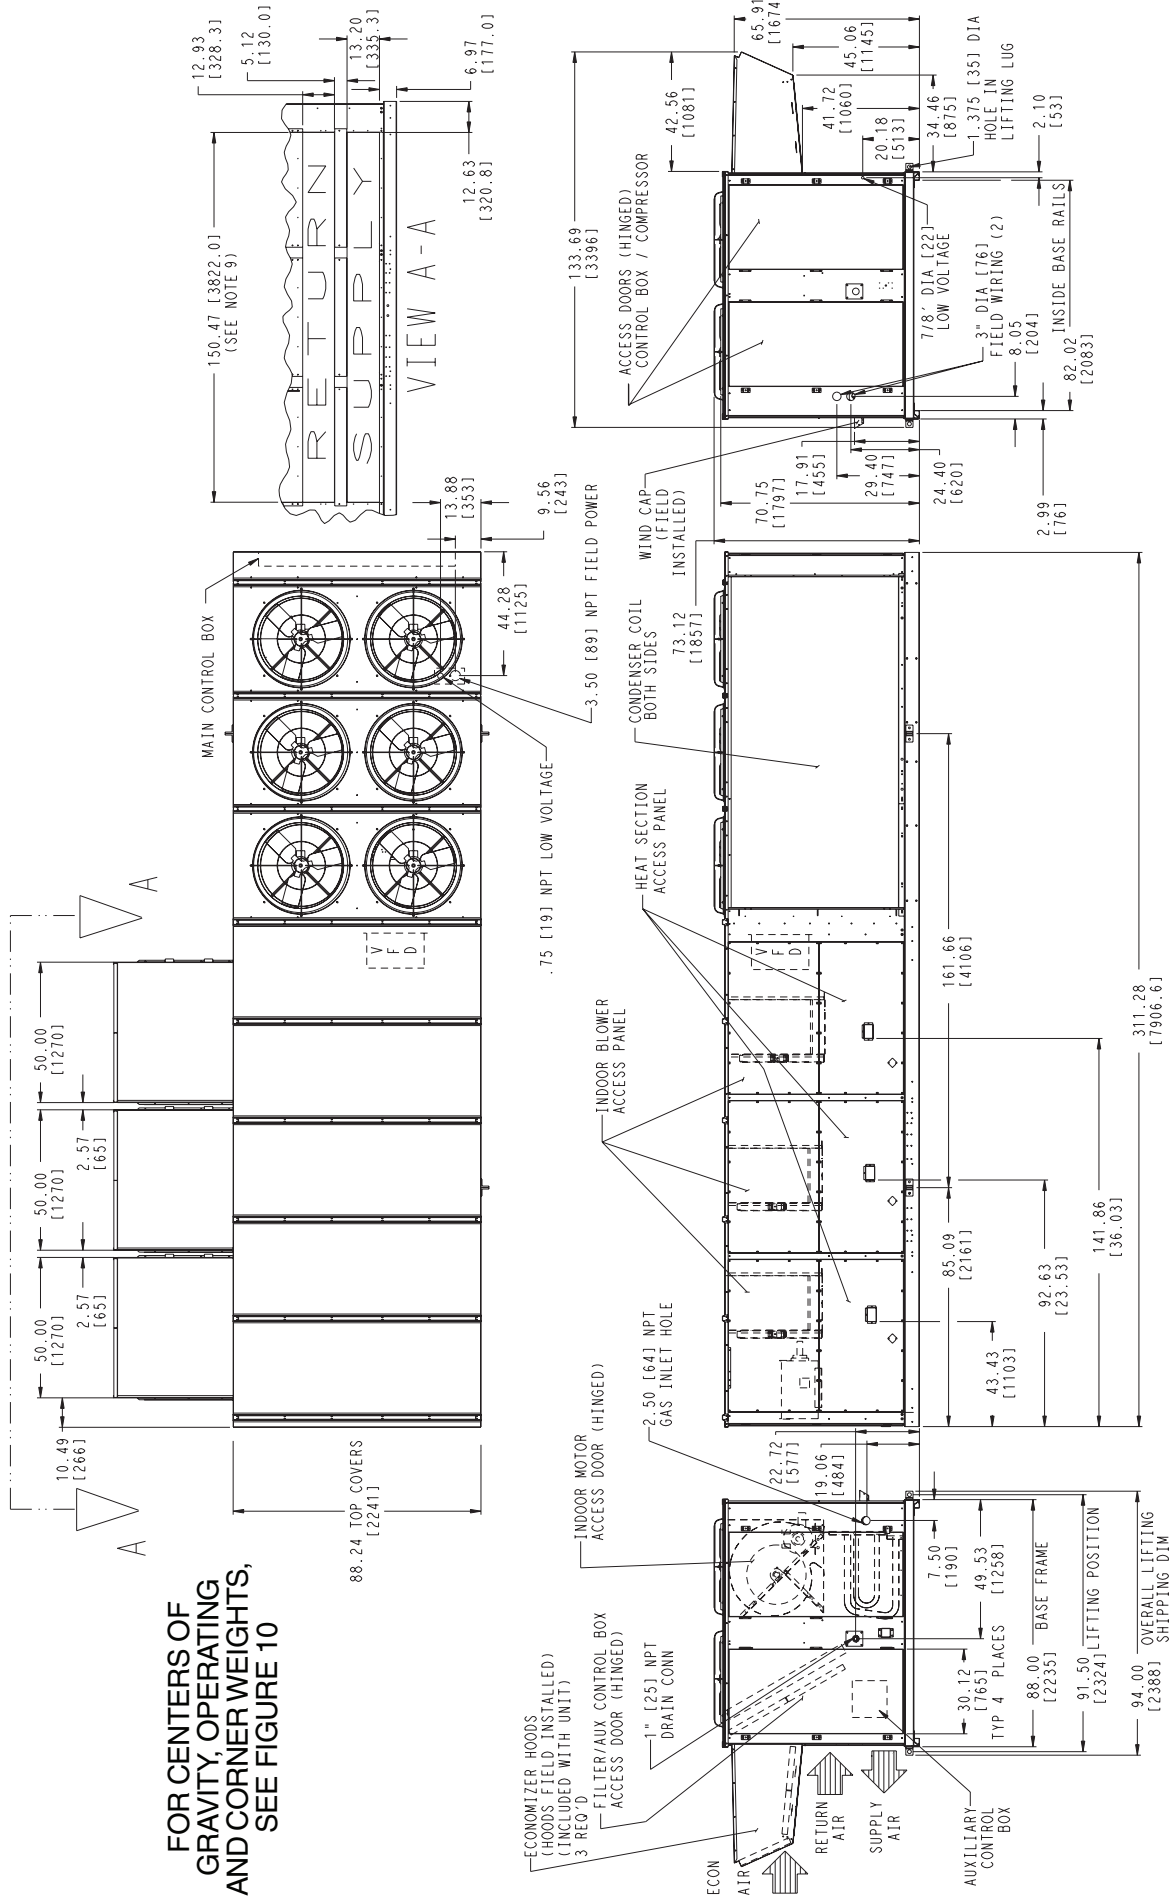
Base Unit Dimensions — 48AW, AY036-050
